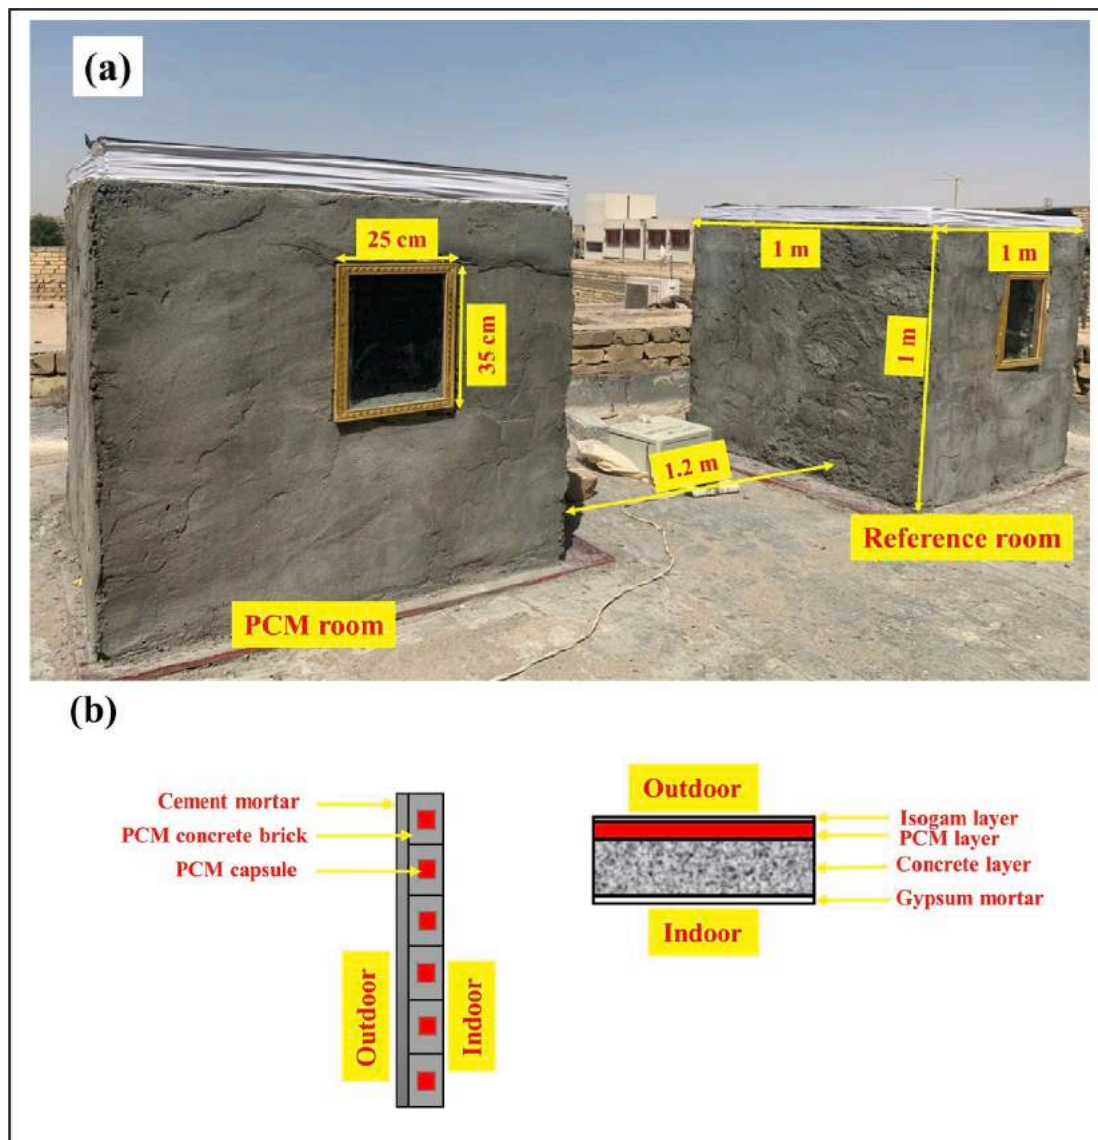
Experimental set-up (a) 3D view of rooms, (b) cross-sections of PCM roof and wall.
